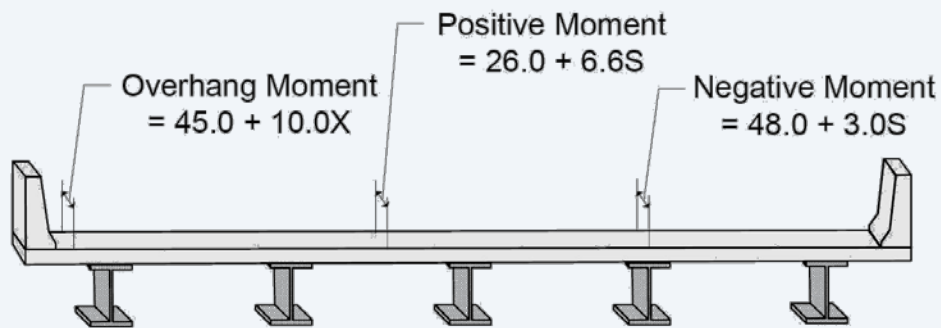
Typical Bridge Section as shown in the FHWA LRFD Design Example [75].
